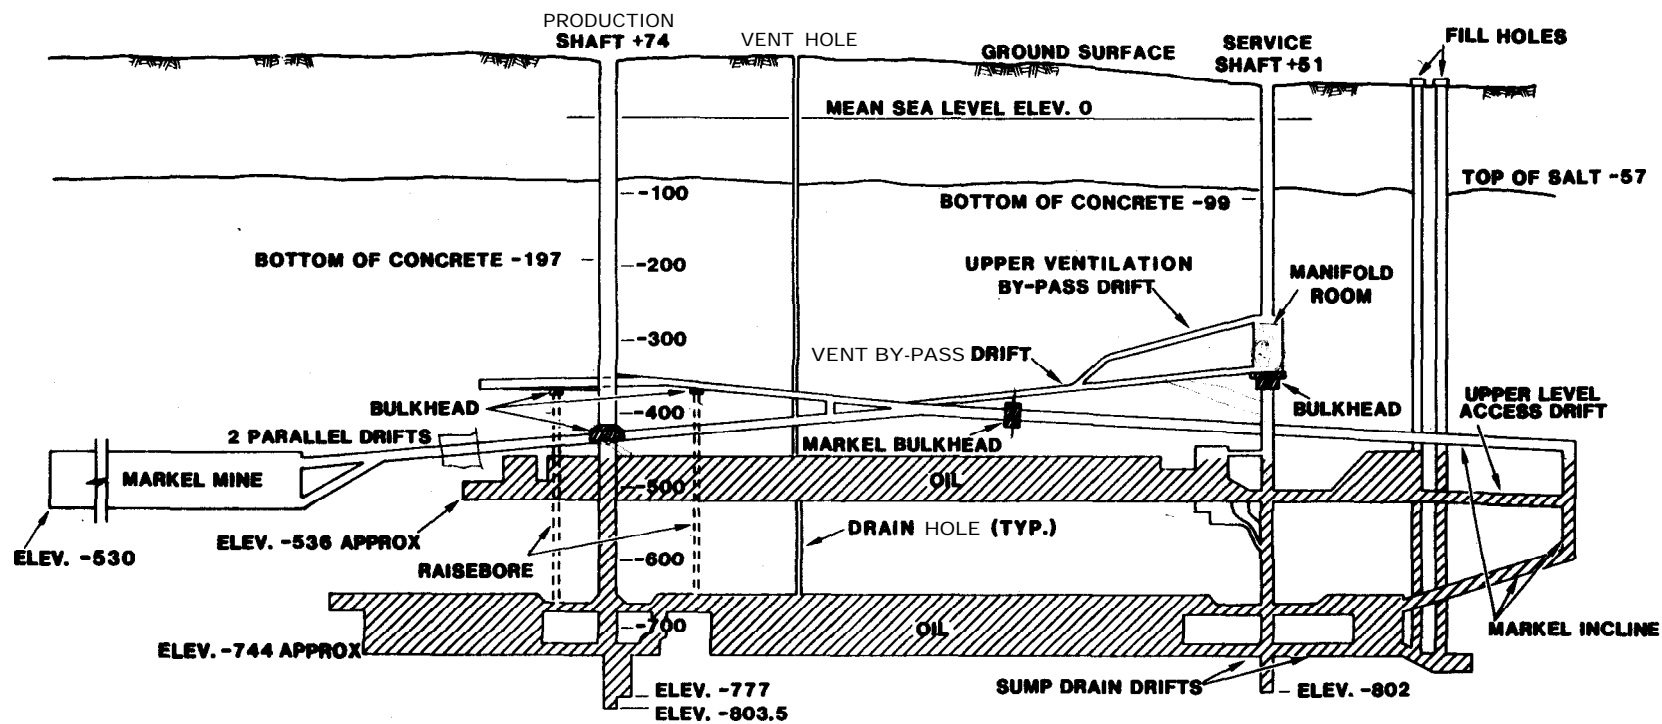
shows a section of the Weeks Island mine. The mine has two levels, an upper level at a nominal floor elevation of -536 feet MSL (Mean Sea Level) and a lower level at a nominal floor elevation of -744 feet MSL. There are a number of entries to the mine from the surface. They are the service shaft, the production shaft, and the fill holes. The service shaft goes from the surface through both levels of the mine. This shaft contains the oil withdrawal pumps for the mine which are located in the sump at the lower level. The pumps discharge through piping in the manifold room, which is an enlarged area of the service shaft, at -355 feet MSL. The production shaft, which was used by Morton Salt, goes from the surface to the
